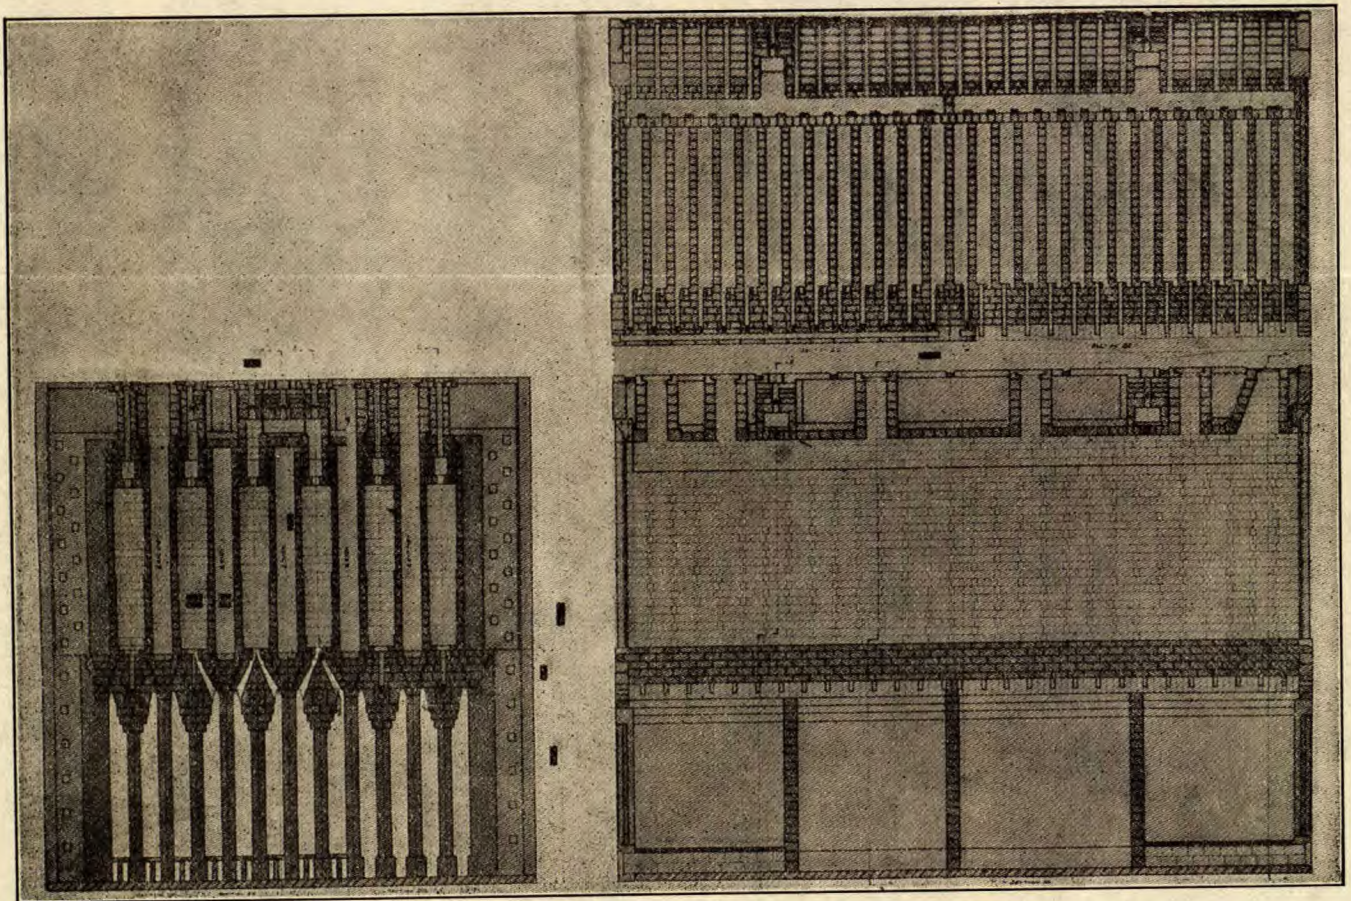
Koppers new combination oven; plan and cross-section. Becker oven.
